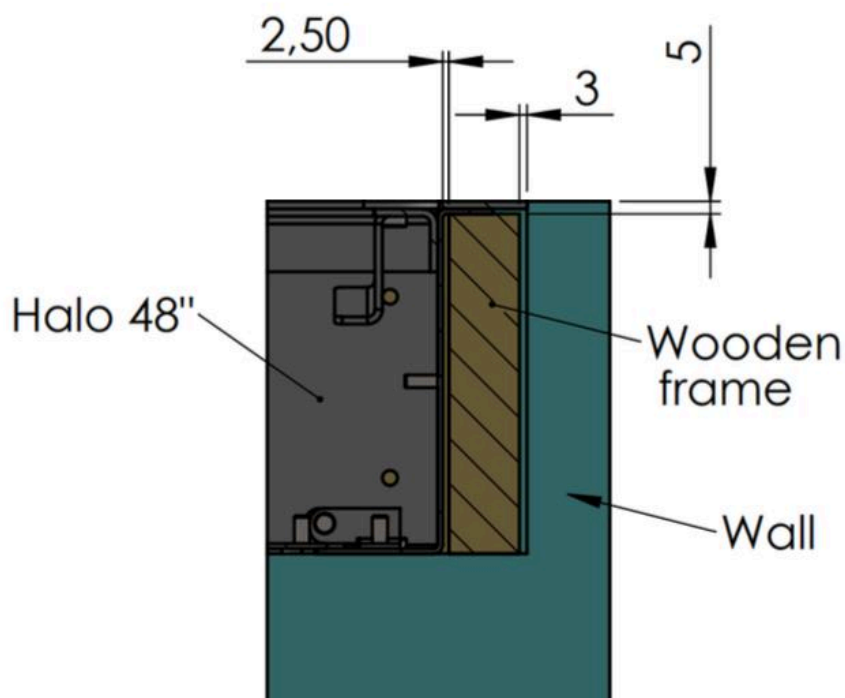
Recessed wooden frame to place CoWin flat with the wall.
